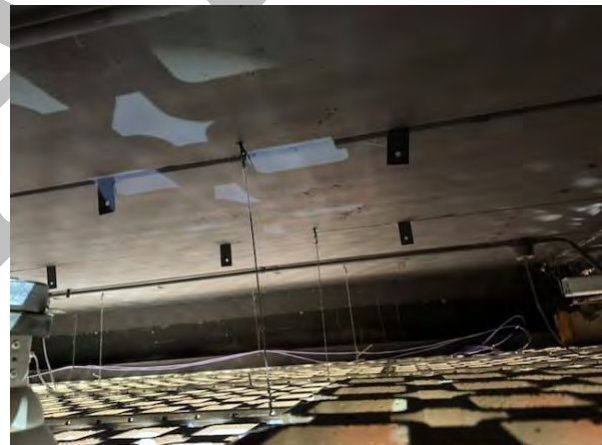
View of pre-cast concrete planks noted to parts of the second floor soffit.
